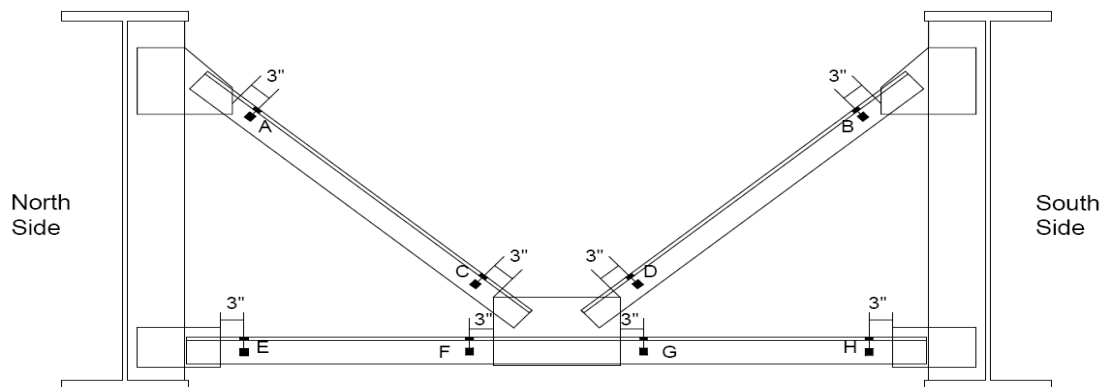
Cross-frame Strain Gauges Cross-Section Labeling, SR 299 over SR 1
